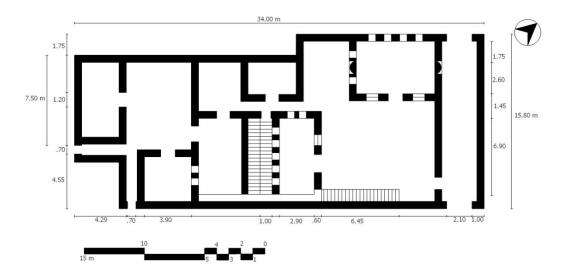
Horizontal Plan of Abdullah Ibrahim Al-Rifai's House
